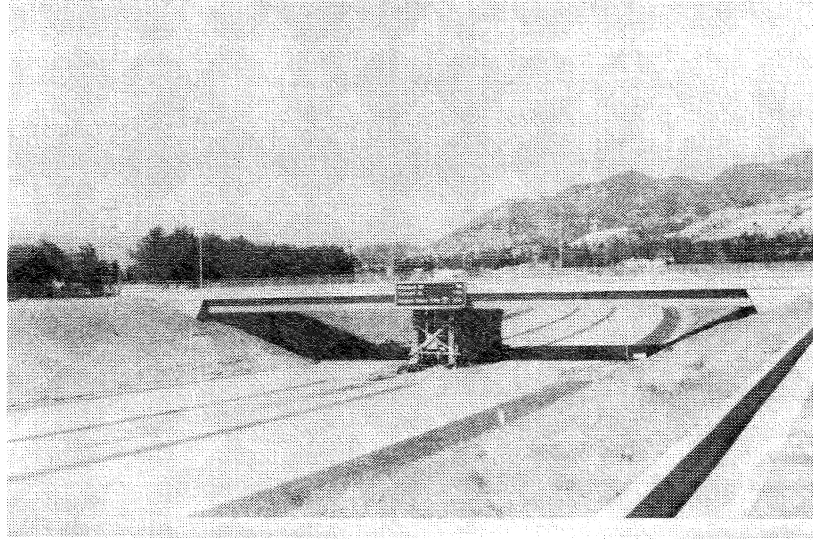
Bledsoe Street Overcrossing, Foothill freeway. A continuous R. C. box bridge with spread footing foundations. The abutments settled relative to the central pier cracking the superstructure deck.
